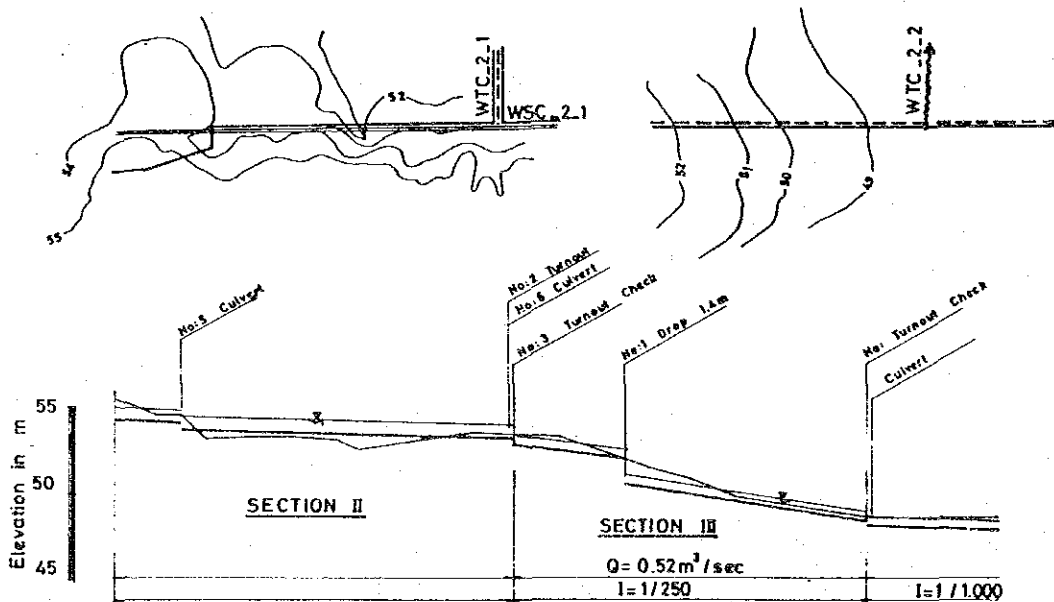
PLAN AND PROFILE OF WSC -1.
